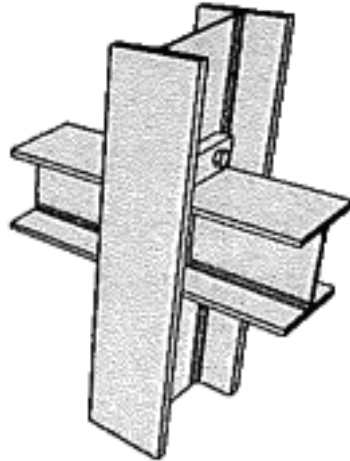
Bolted hot rolled steel beams, adopted from SBI (1988).
